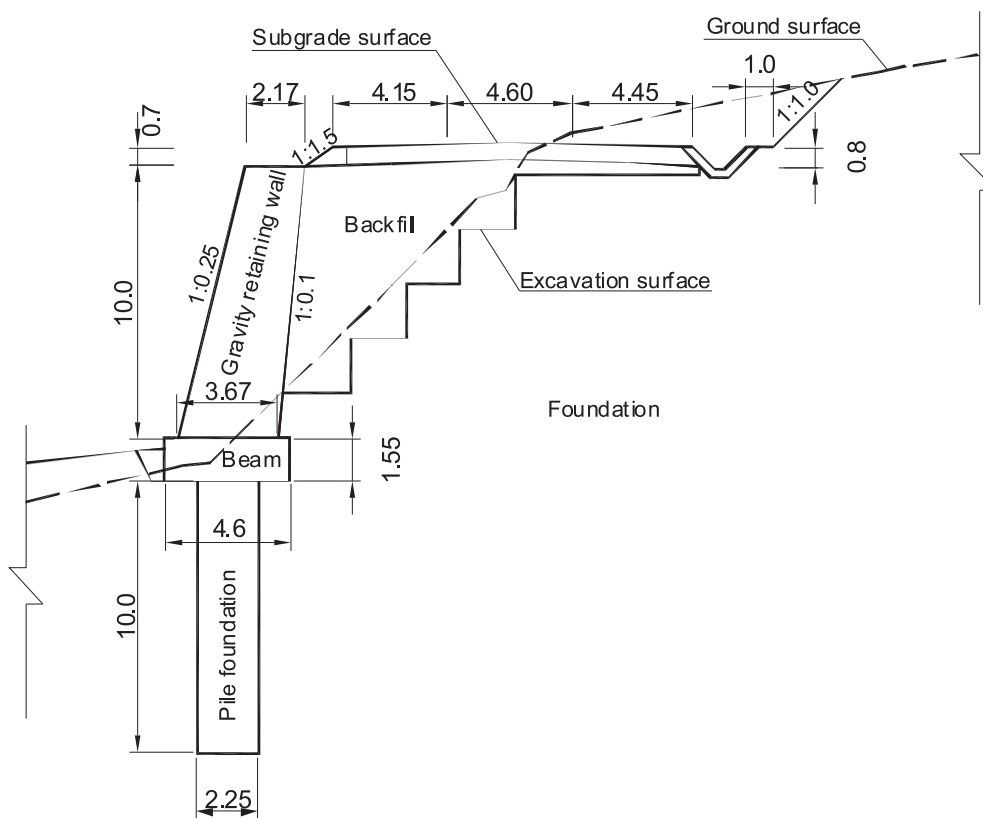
Cross-sectional geometry of the piled gravity retaining wall at station DK242+121 (all units in meters).
